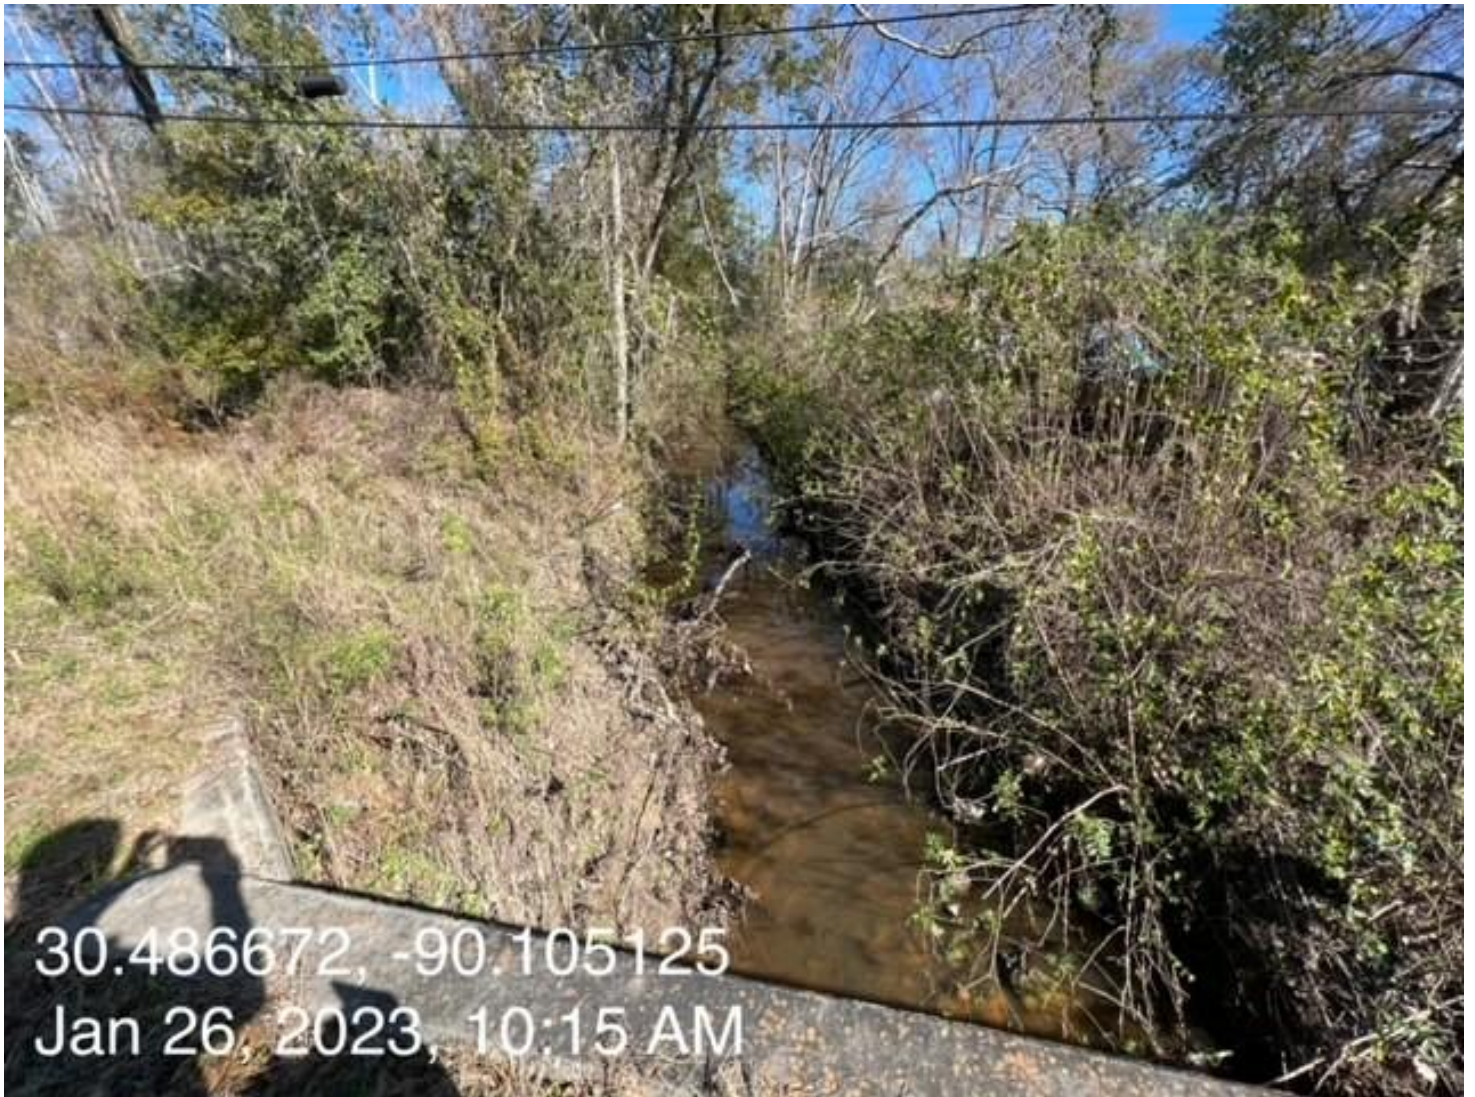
Facing South. Photo take from Mile Branch ROW.
